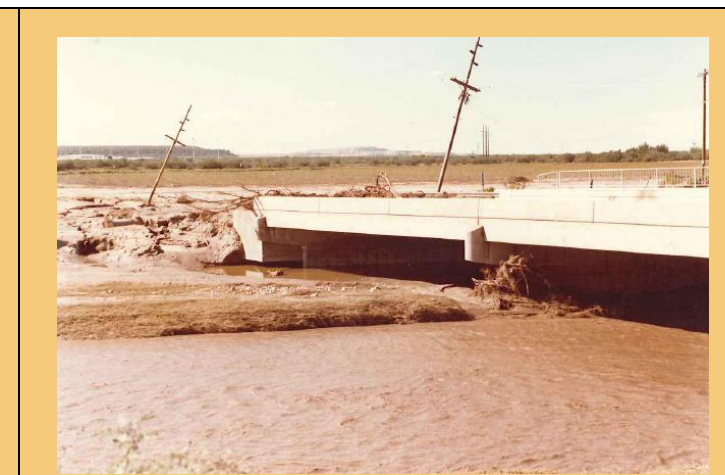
1993 bridge damage at Sahuarita Rd. Bridge.
